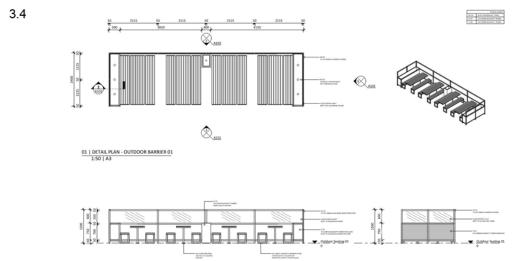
Elevation, plan and isometric views of the outdoor dining structure, of which there are two proposed (Source: Application Documents).
